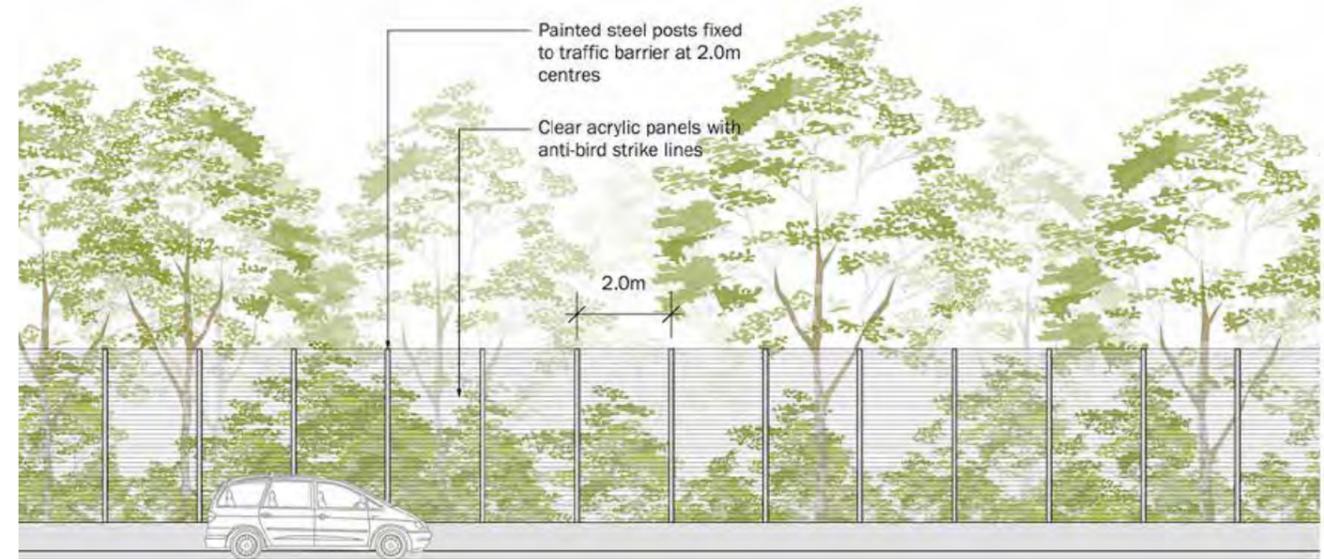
Elevation of noise wall with clear acrylic panels - Finish type NW-F2 (Scale 1:150)
